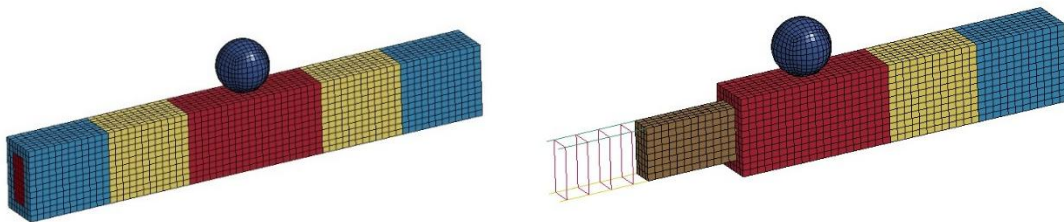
Finite element model of reinforcement concrete beam with drop hammer
